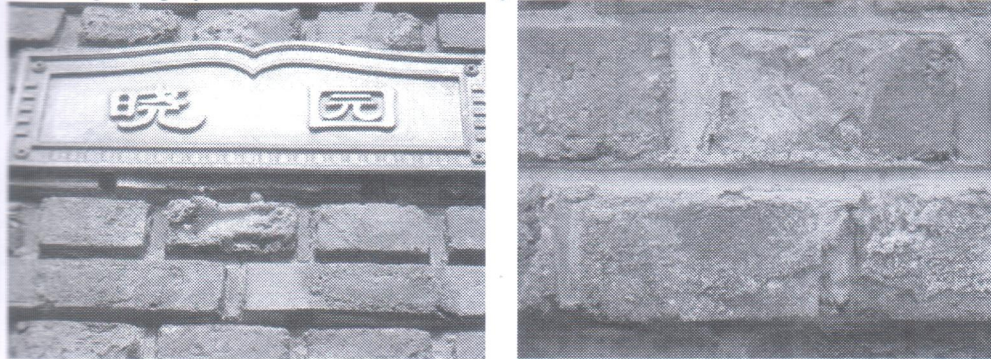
Original deeply recessed joints (left) and repaired with cement which damages entire image of brick facade
